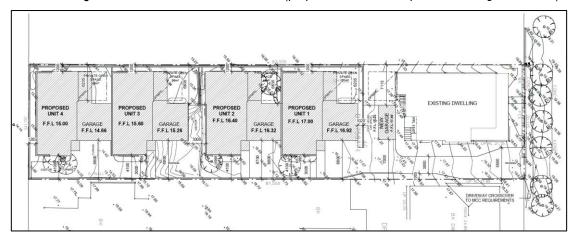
Proposed Site Plans. (Source: AGCAD Design Plans - Extract)
